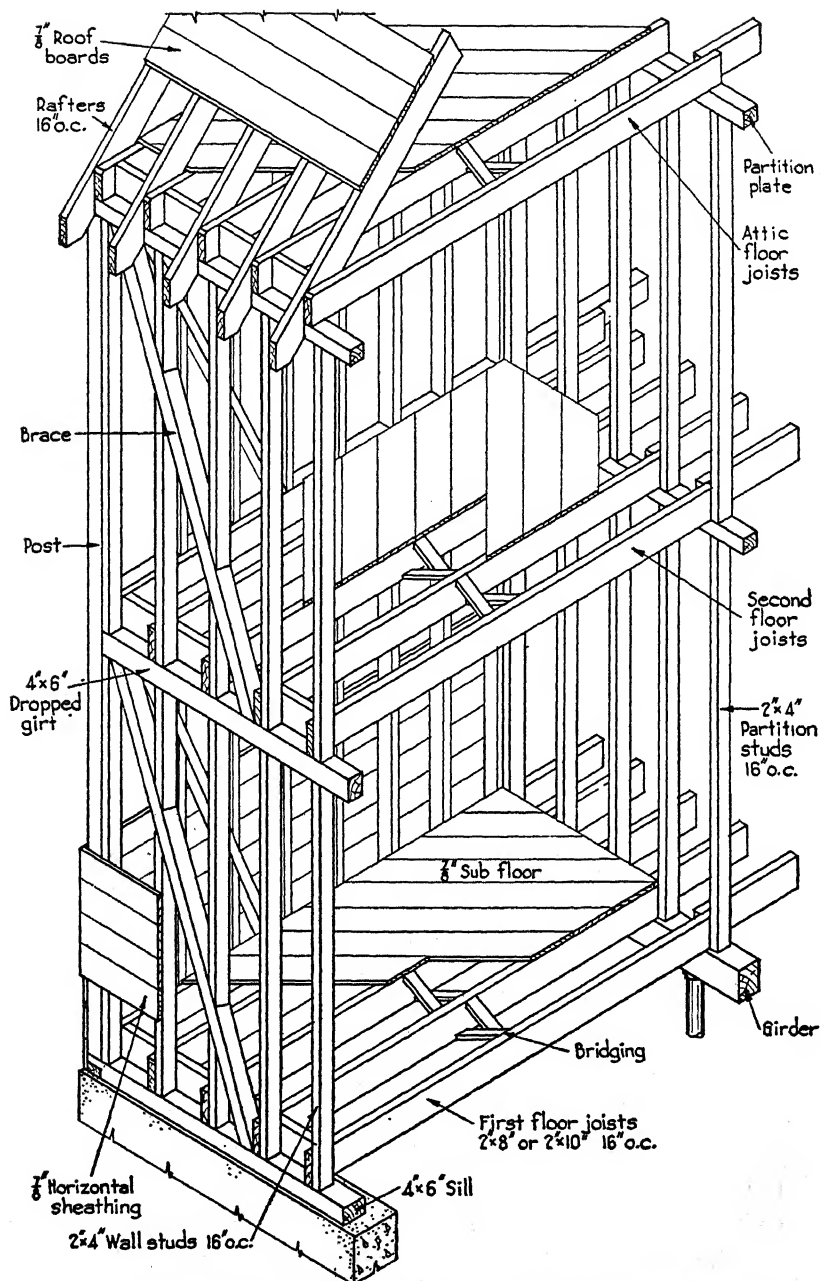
DETAILS, AMERICAN BRACED FRAME CONSTRUCTION
